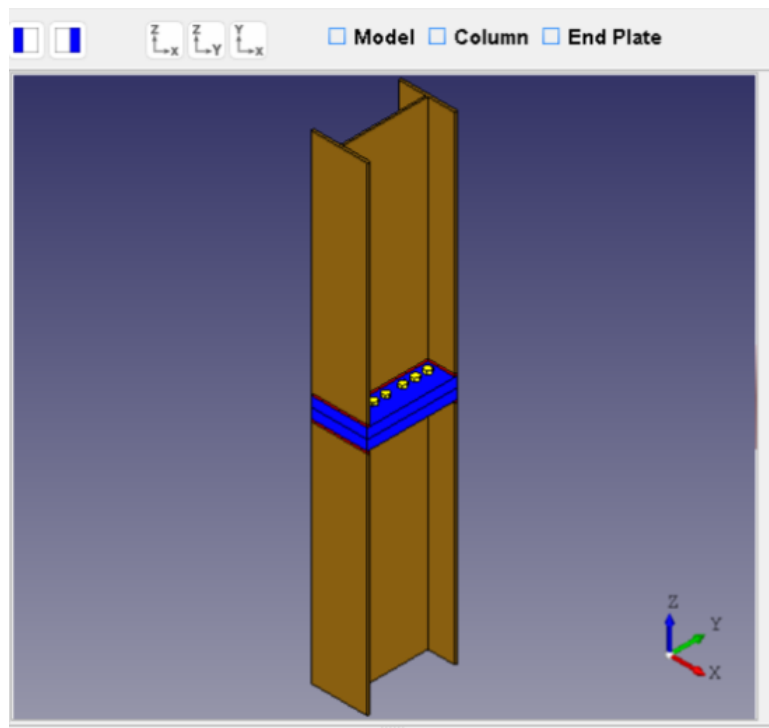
3D drawing output of typical Column-Column End Plate connection
